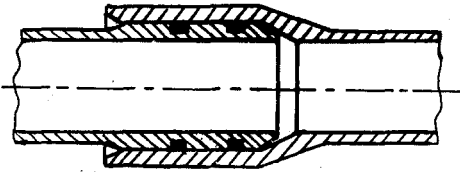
ILLUSTRATION OF SPIGOT AND SOCKET JOINT WITH DOUBLE RUBBER GASKET
